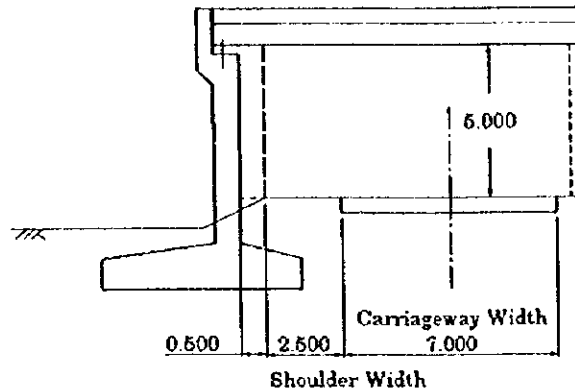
Required Offset of Abutment from Edge of Carriageway (National & State Highway)
